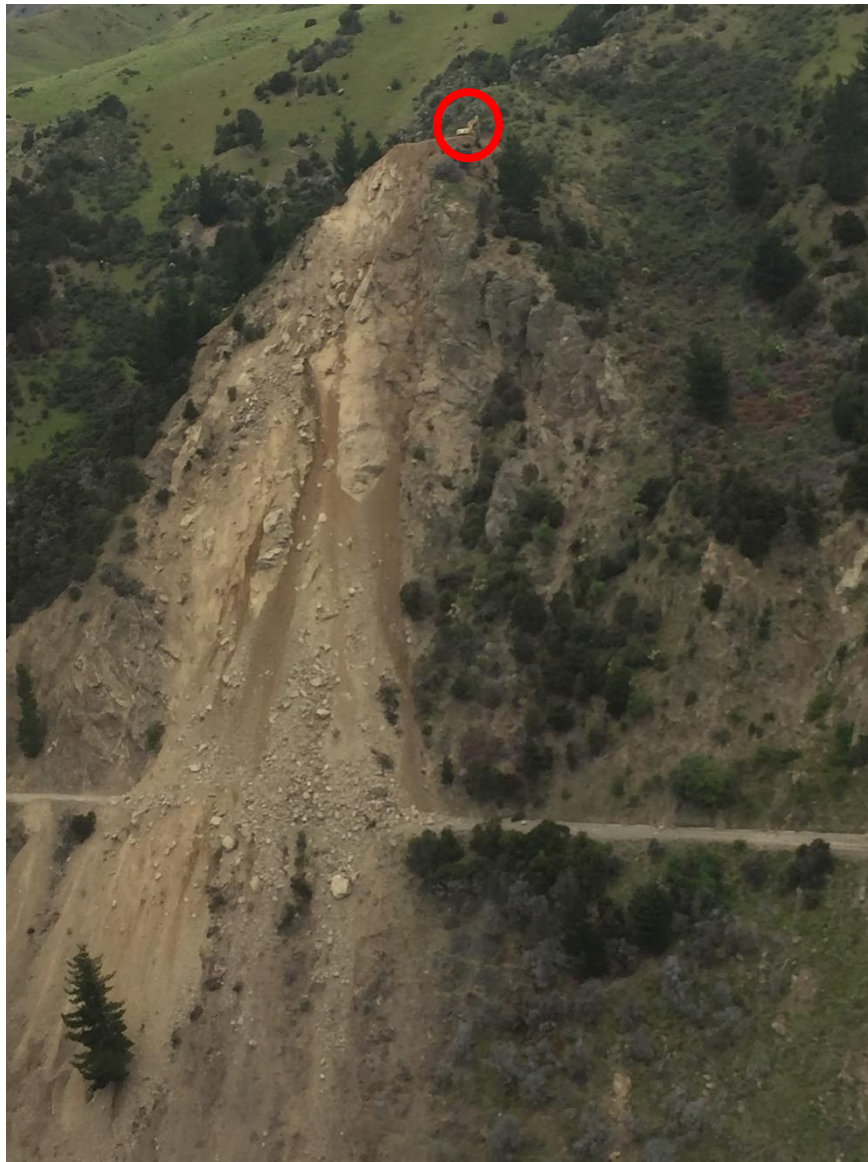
Awatere Valley Road blocked by landslide, excavator for scale (Steve Murrin, 2016).
